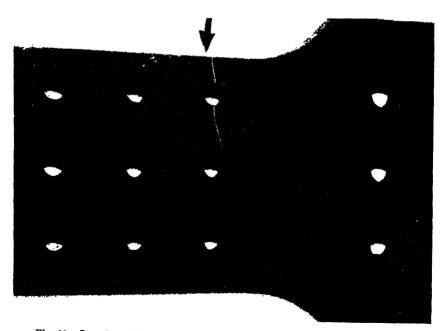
Location of Failure in Joints Fabricated with Bolts When the Failure Occurred Within the Joint. (Specimen D-8)
